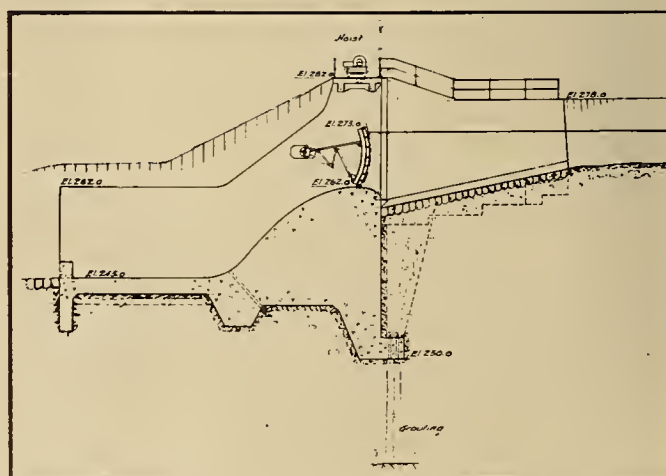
Cross-section of diversion dam foundation, grouted cut-off wall, baffle wall, north curtain wall, gates and operating mechanisms.
